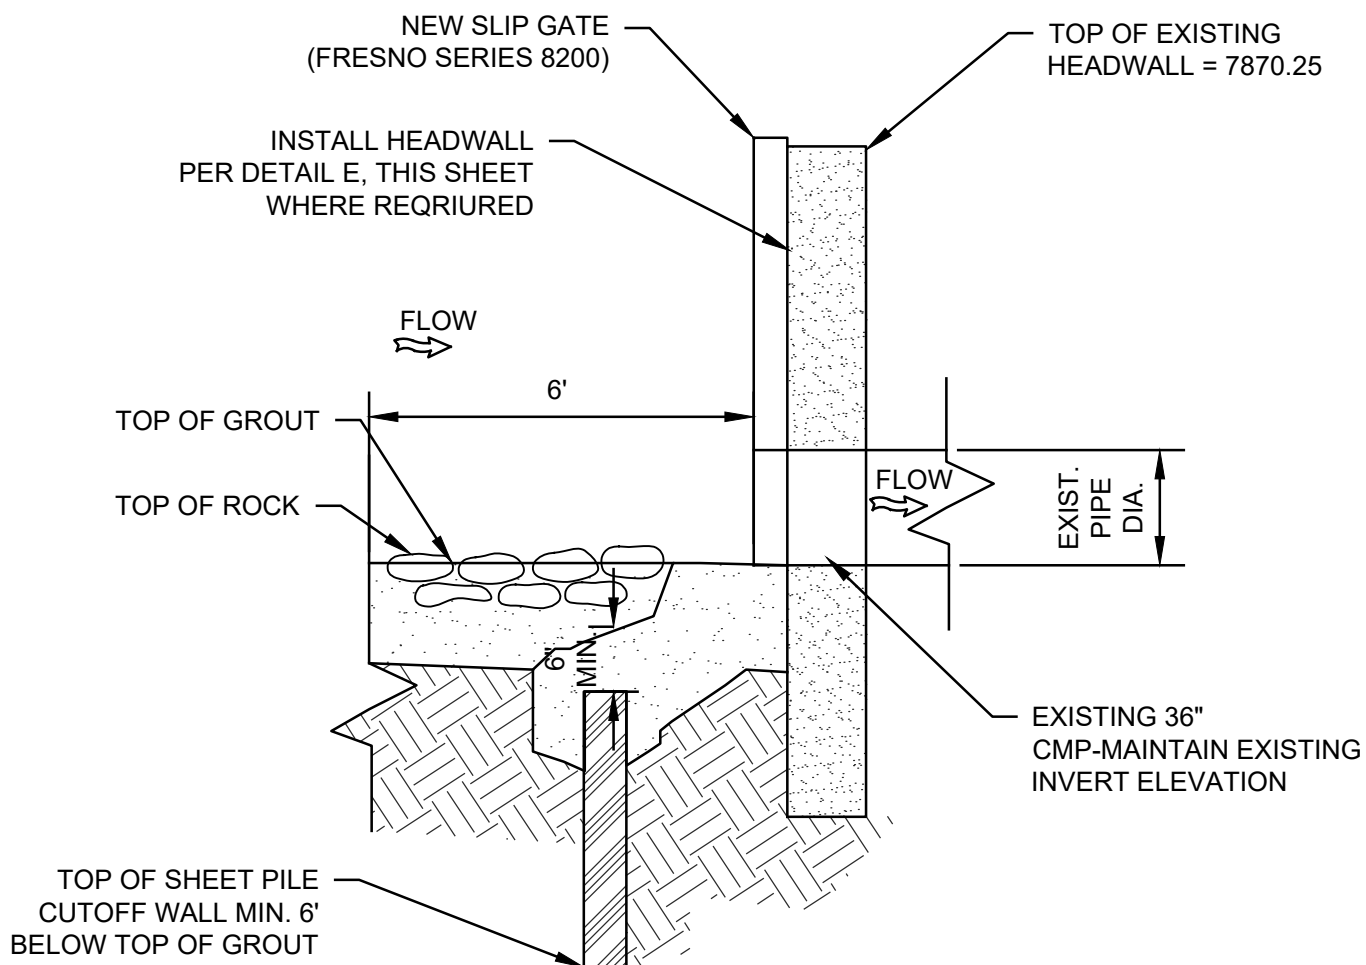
DETAIL D - "NRCS" EMBANKMENT PROTECTION
